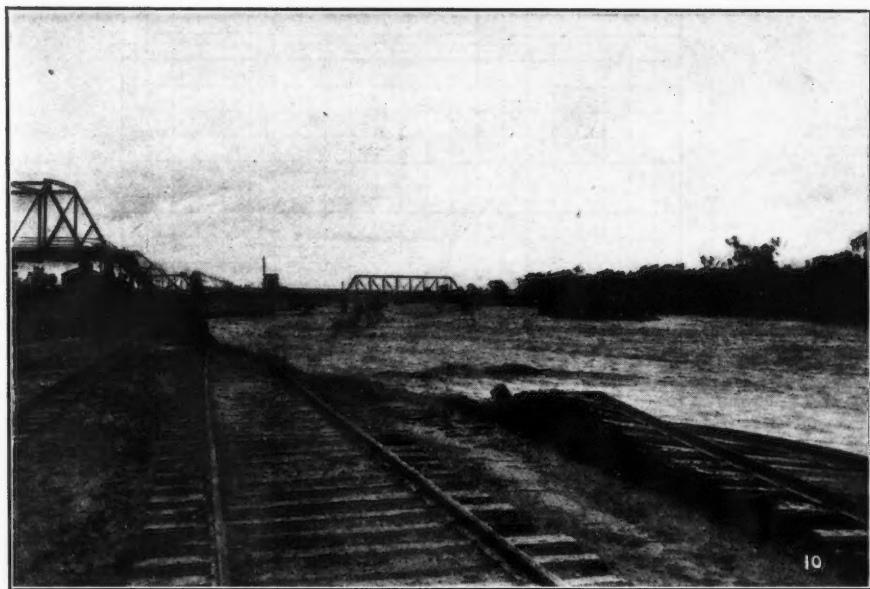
BRIDGE AND TRACK DESTRUCTION BY FOUNTAIN CREEK AT FIRST STREET, PUEBLO, COLO.
